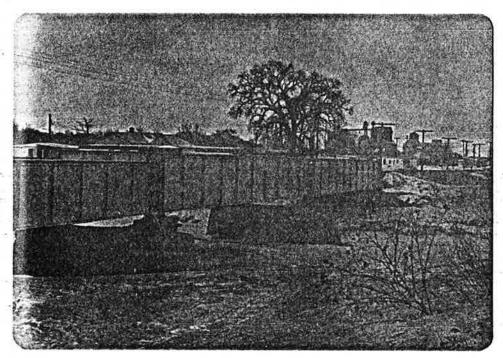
Railroad bridge paralleling Highway 81 bridge. View of downstream side.
